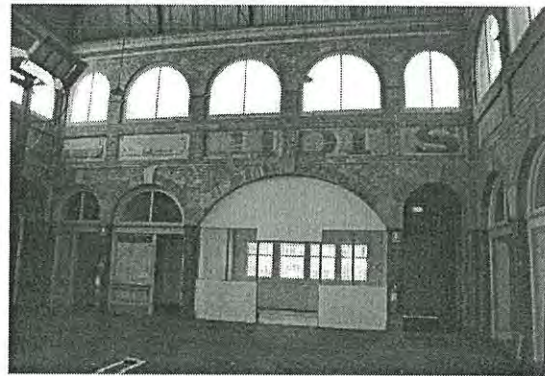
Interior, Exchange Hall (space H01). View of east wall. Note the introduced large arched opening (with introduced infill) that was once two booth arches.
